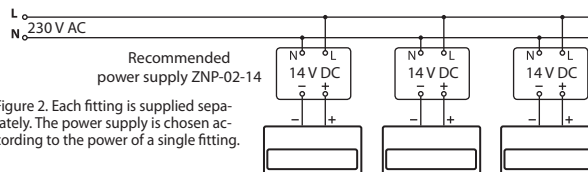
Each fitting is supplied separately. The power supply is chosen according to the power of a single fitting.
